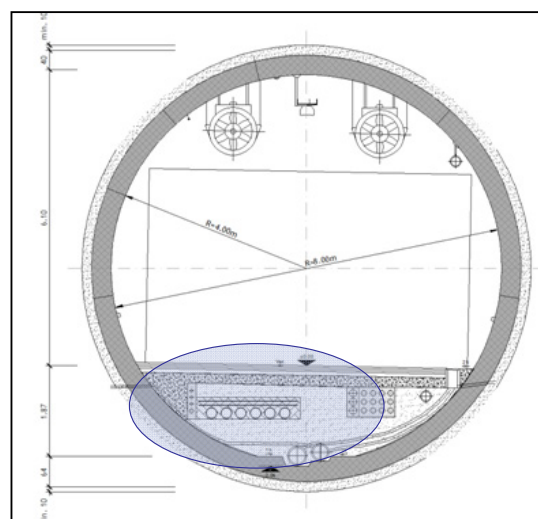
A TUNNEL; TYPICAL LAY-OUT OF THE CABLES INSIDE THE SAFETY GALLERY OF THE MOTORWAY FREJUS TUNNEL
